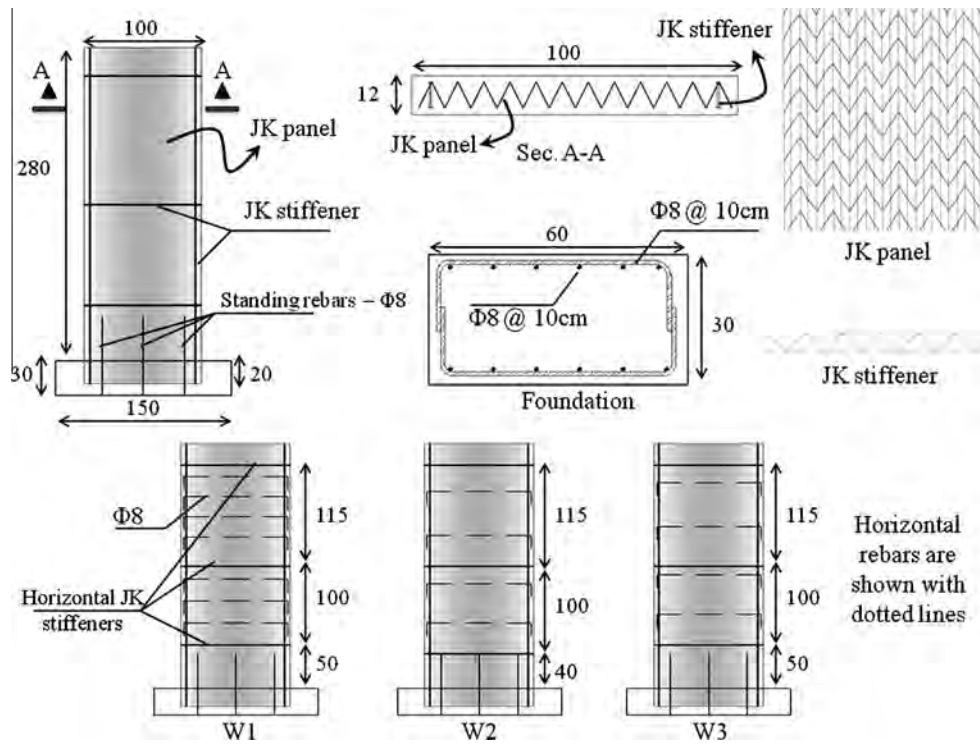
Details of the test specimens (all dimensions are in centimeters).
